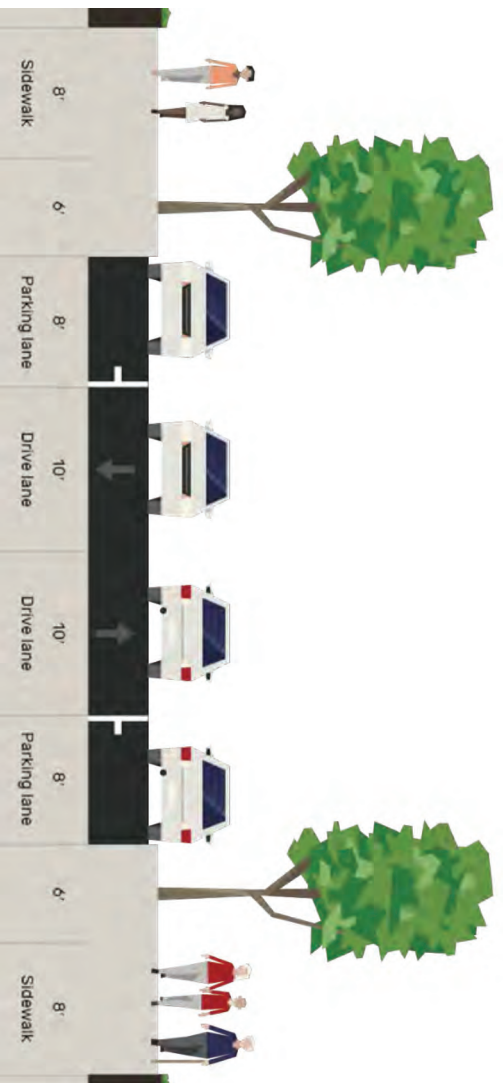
A: EXISTING LOCAL STREET CROSS-SECTION WITH CURB (SOURCE: STREETMIX)
